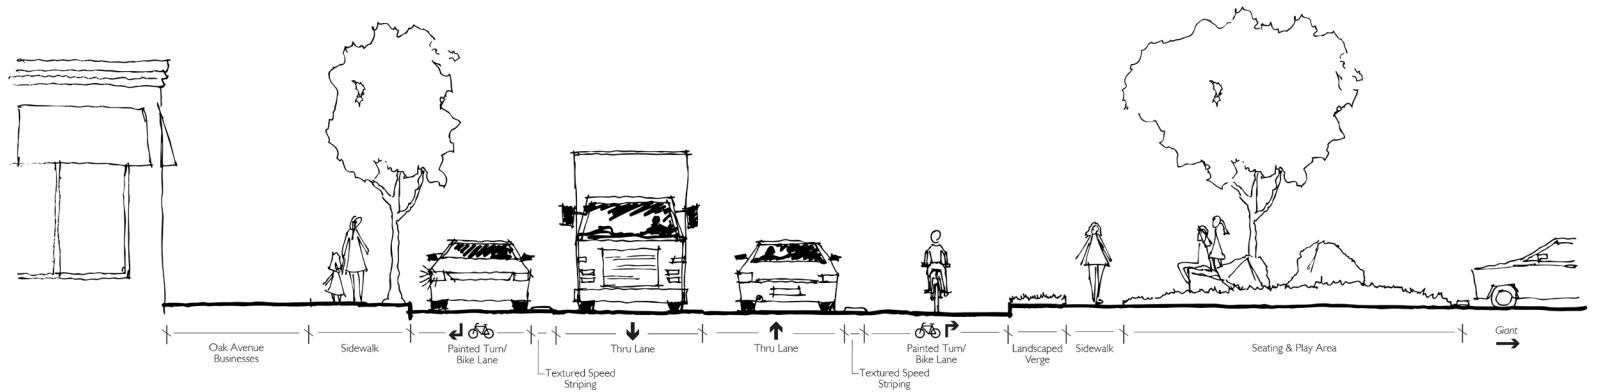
| Oak Avenue Streetscape Recommendations, Part 2
